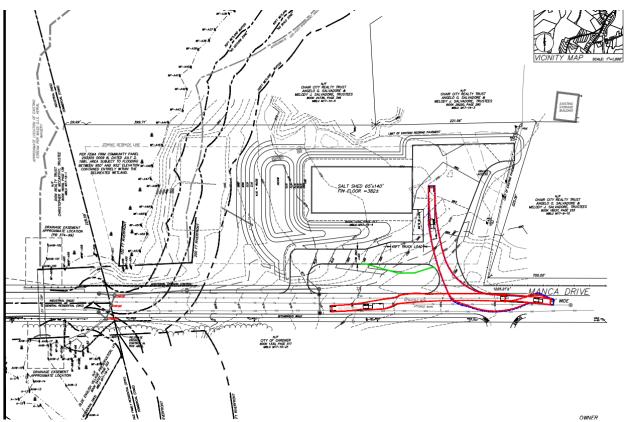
Engineering Content Design by Hannigan Engineering for New Salt Shed Project
